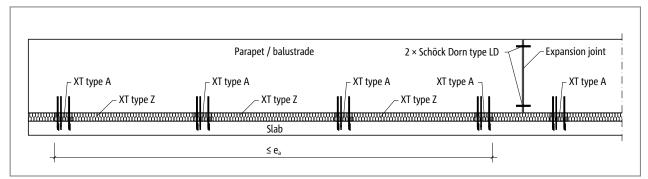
Schöck Isokorb® XT type A: Expansion joint arrangement
